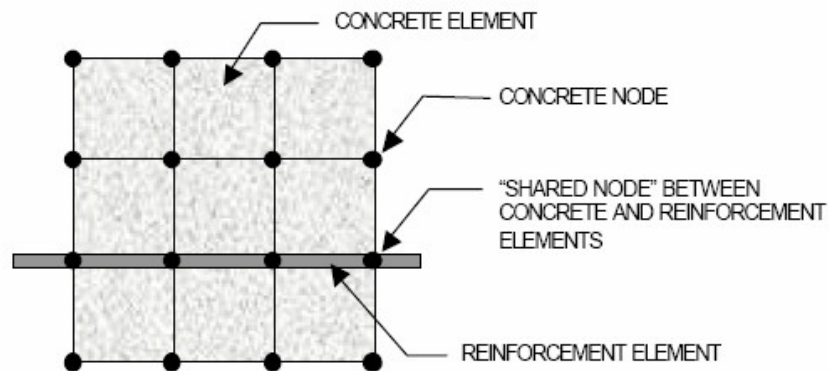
Idealization of rebar in concrete with discrete reinforcement modeling (Tavarez 2001)
